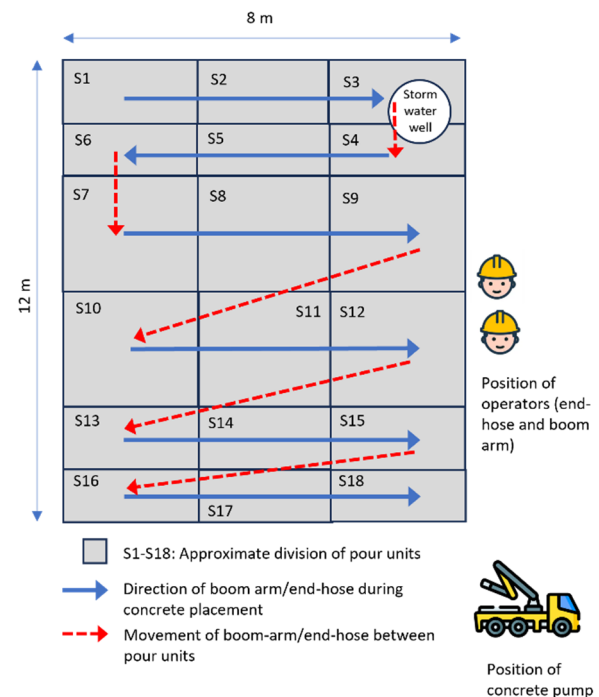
Schematic layout of the pour units and direction of concrete placement.
